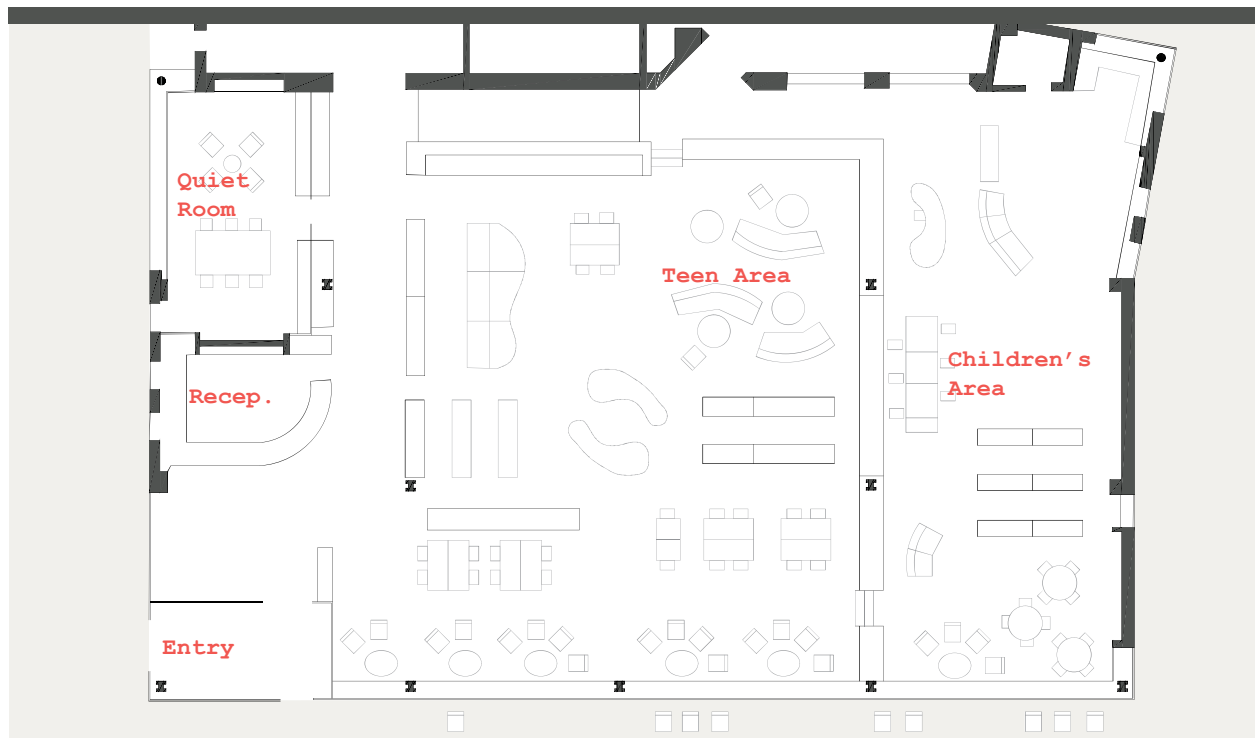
William Rawn Associates, floor plan, East Boston Branch Library, Boston, MA, 2013.
